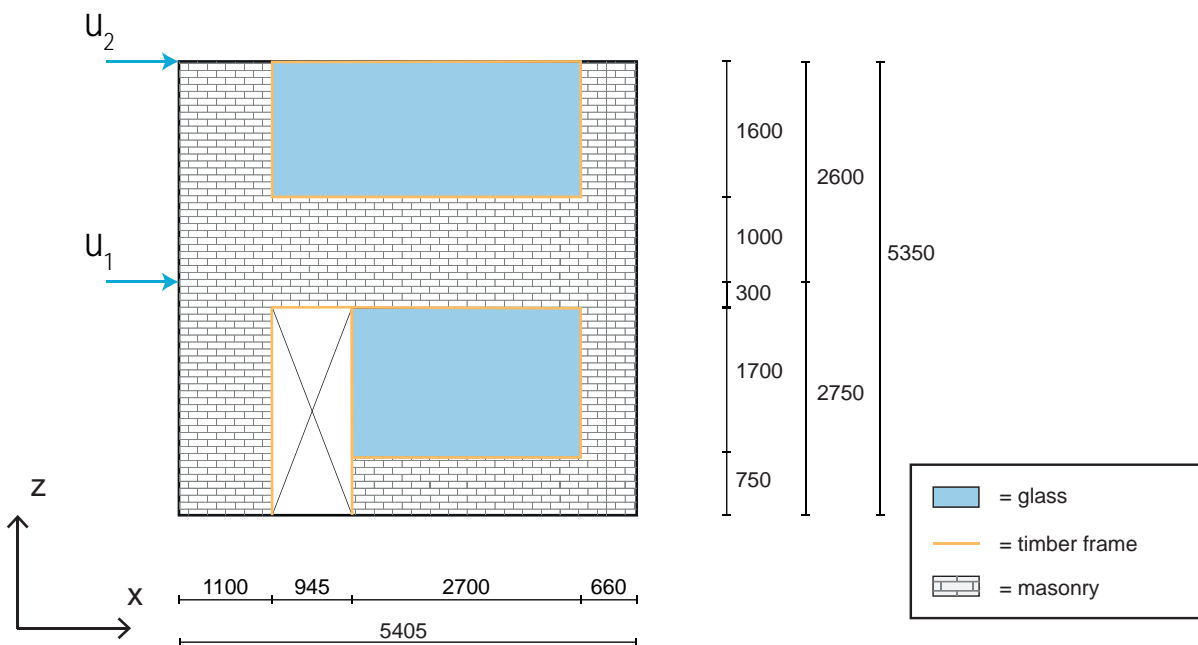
Build-up of the strengthened model used for the terraced house without openable window sections
